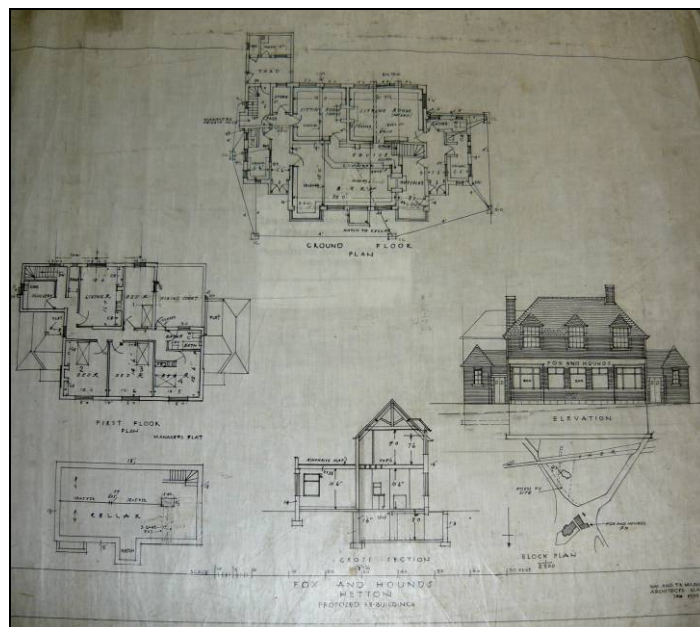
Building control plan of the 'Fox and Hound' dated 1939
